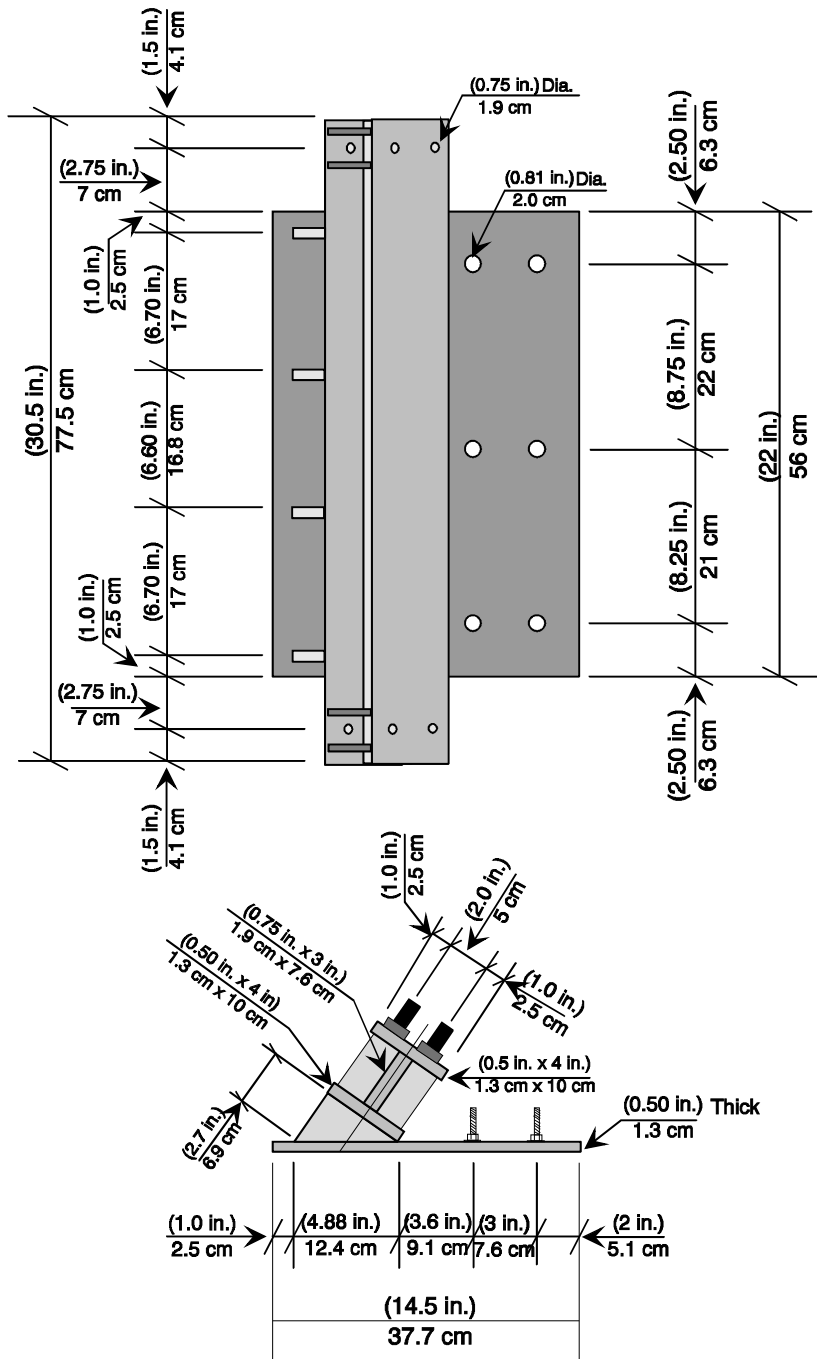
Details of Top Plate Assembly for External Diagonal Post-Tensioning
